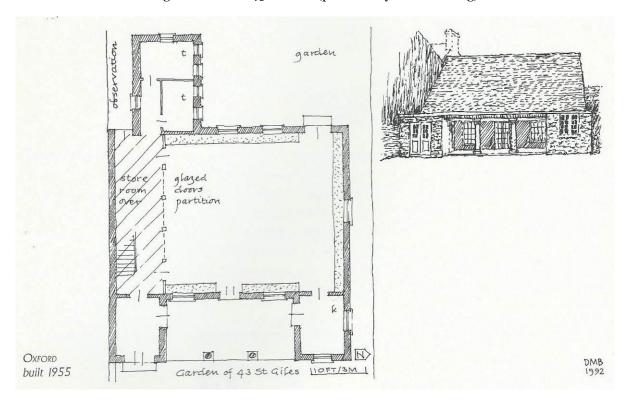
Plan and elevation of 1955 meeting house, from Butler, p. 502
